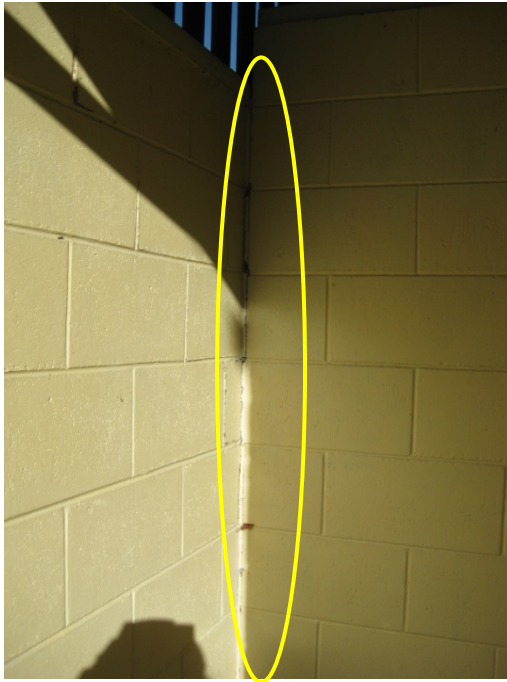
Cracking along Mortar Joint in SE Corner of Ladies
